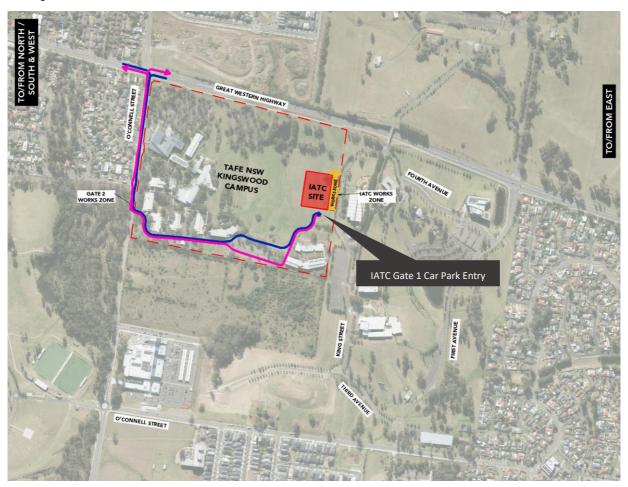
Construction Vehicle Routes (Routes 2)
